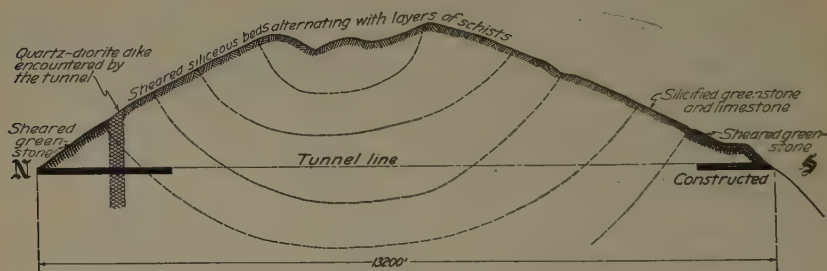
CROSS-SECTION OF ROCKS ACROSS BRIDGE RIVER TUNNEL LINE. (COURTESY OF V. DOLMAGE.)
